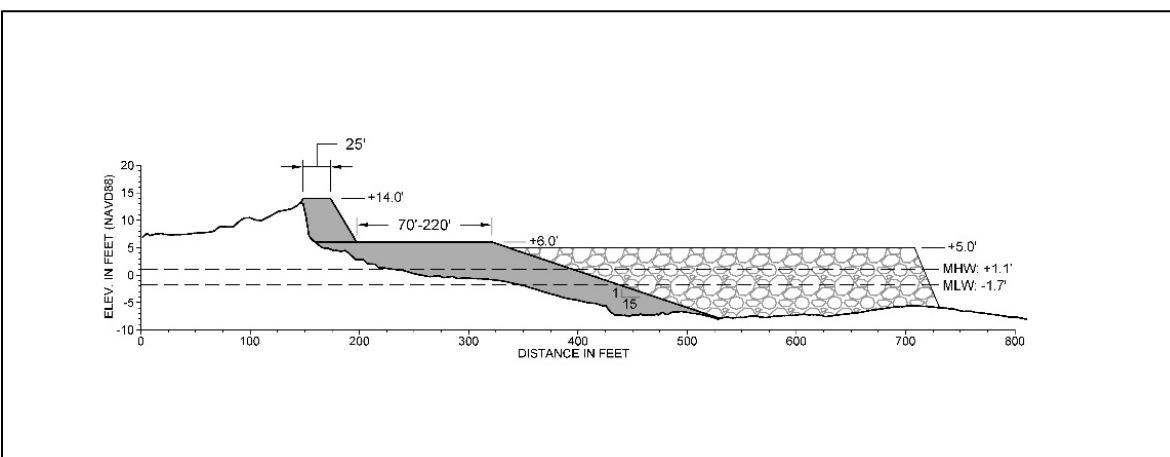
Alternative 4 Terminal Groin and Beach Fill Profile.
